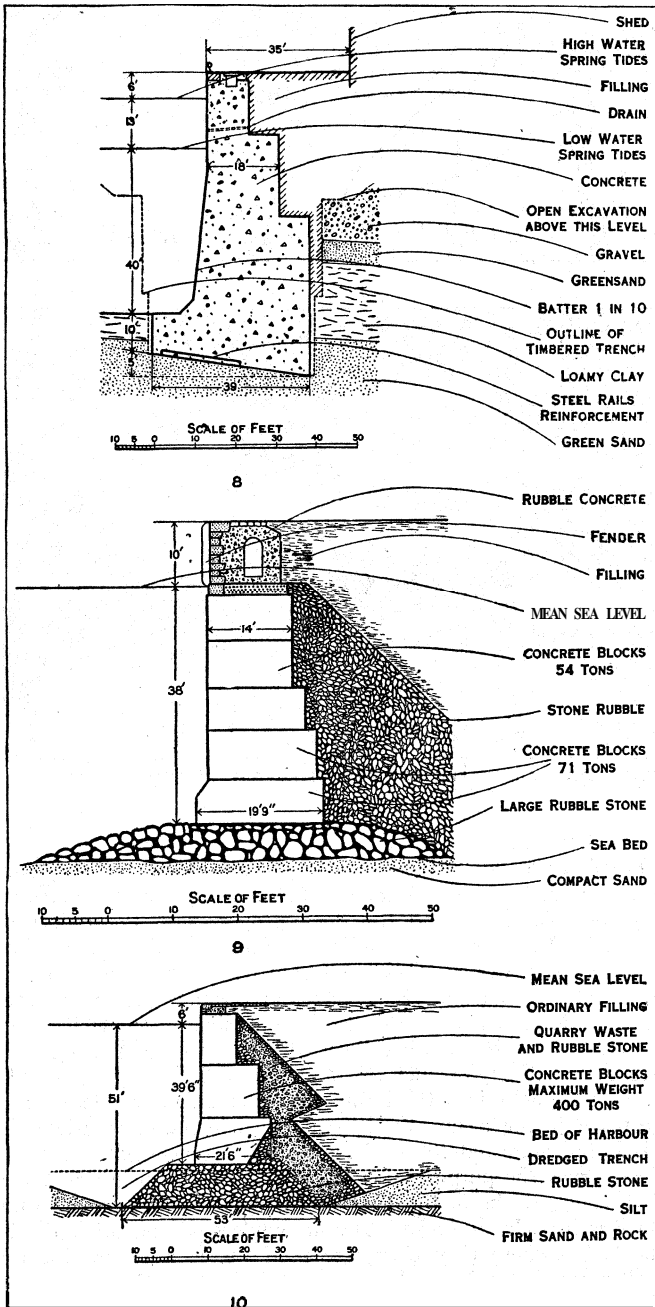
SOUTHAMPTON-OCEAN DOCK. SECTION OF QUAY WALL BUILT IN THE DRY IN TIMBERED TRENCH. FIG. 9. GENOA—VITTORIO EMANUELE III BASIN QUAY WALLS OF SUPERIMPOSED CONCRETE BLOCKS. WITHOUT LONGITUDINAL BONDING. CONSTRUCTED ON RUBBLE MOUND FOUNDATIONS IN DEEP WATER. FIG. 10. QUAY WALLS, 1927. AT MUSTAPHA BASIN. ALGIERS
